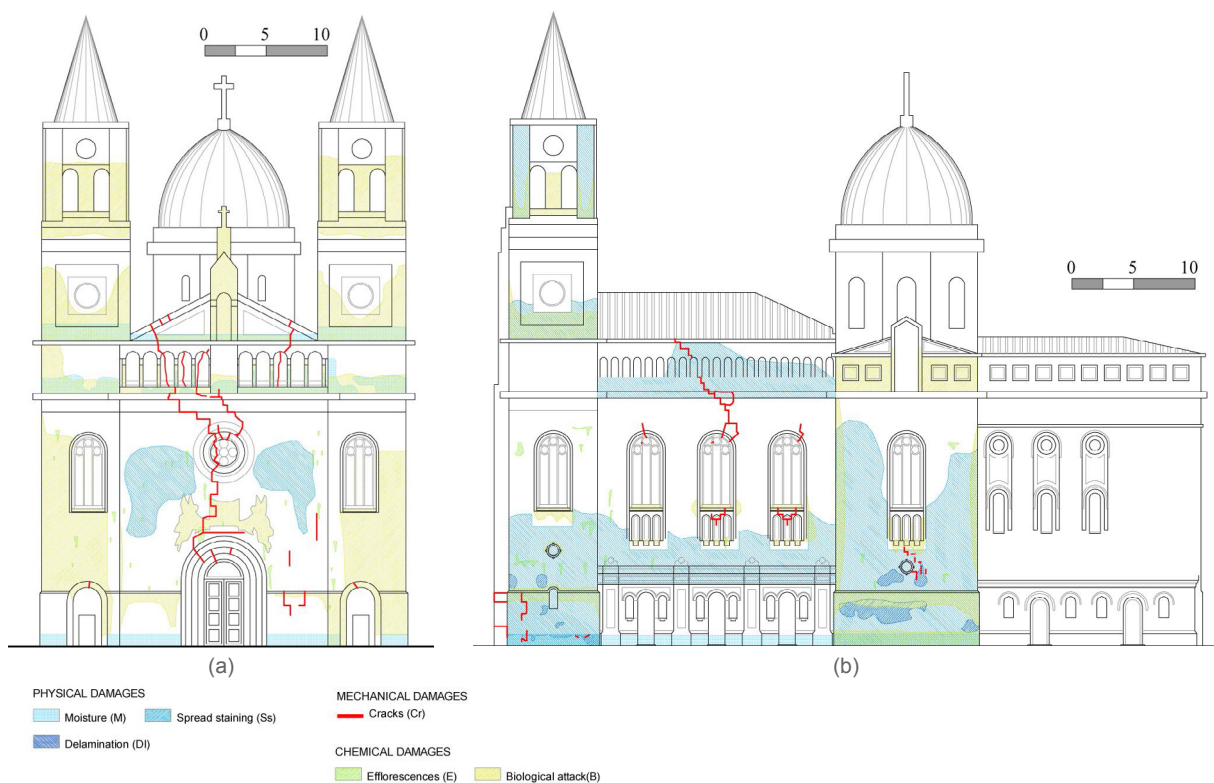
Damage map: (a) façade (b) eastern elevation (Ogrizovic et al., 2013)
